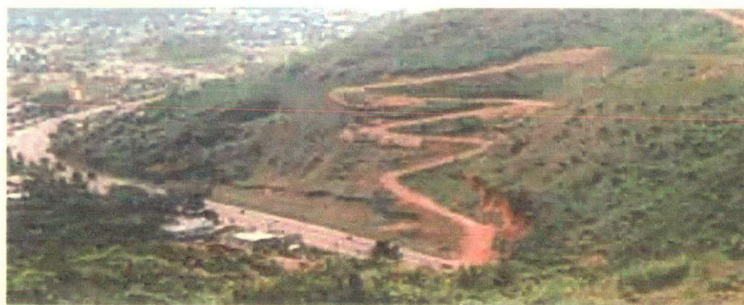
Hill top road from Simhachalem to Kailasa Giri.
